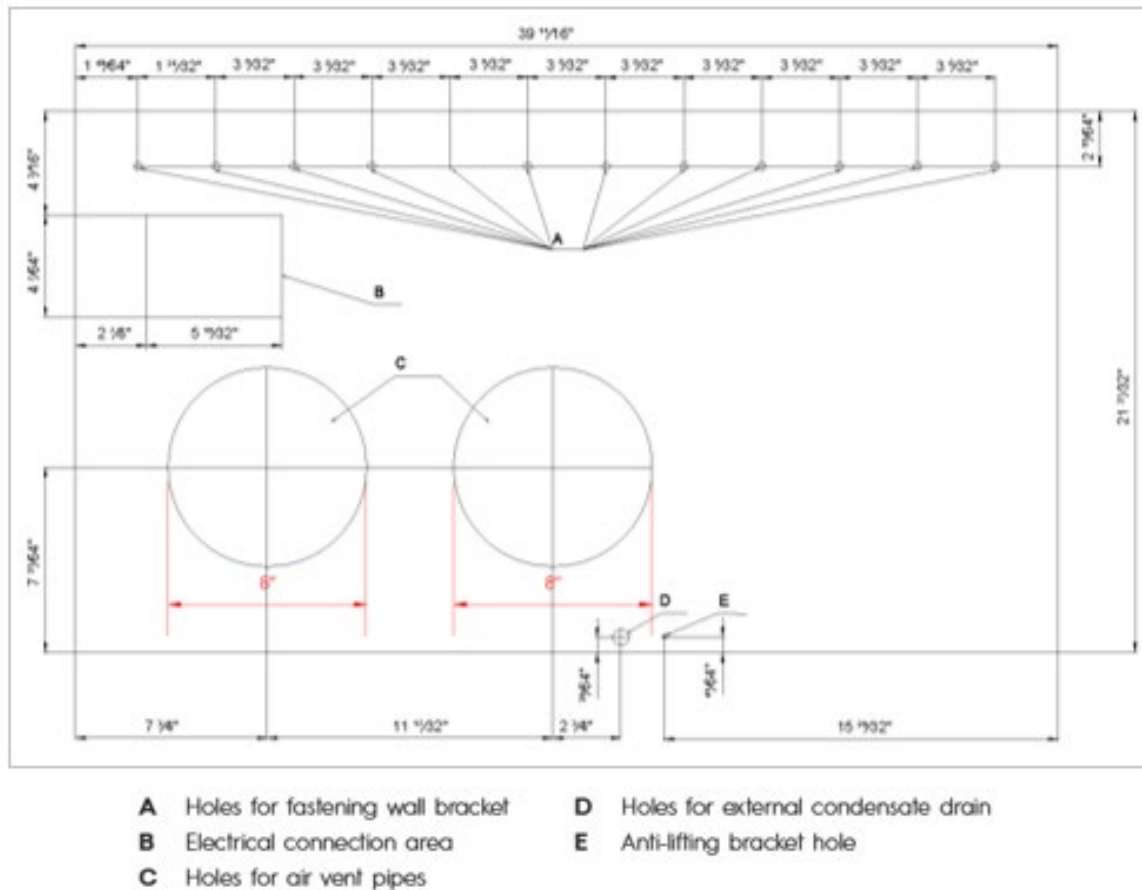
Innova HPAC 2.0 Mounting Template with Opening Dimensions
